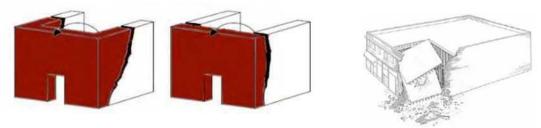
The floor damage mechanism through seismic action perpendicular to the plane of the wall.
